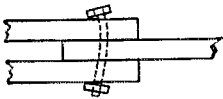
Bolt failure at antenna-mast joint.
